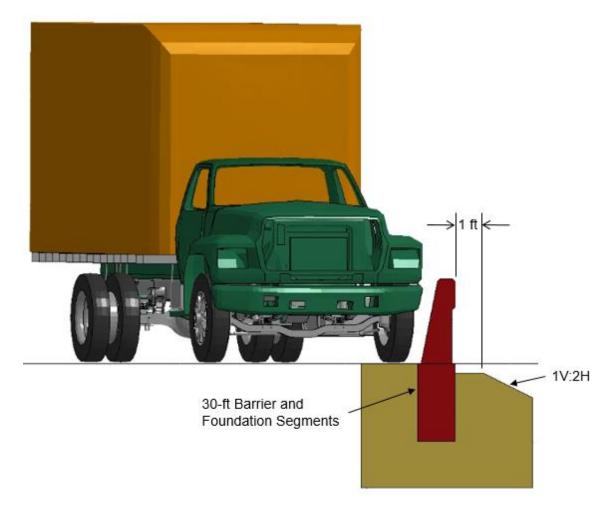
Model of TRF Foundation Selected for Reinforcement Design.
